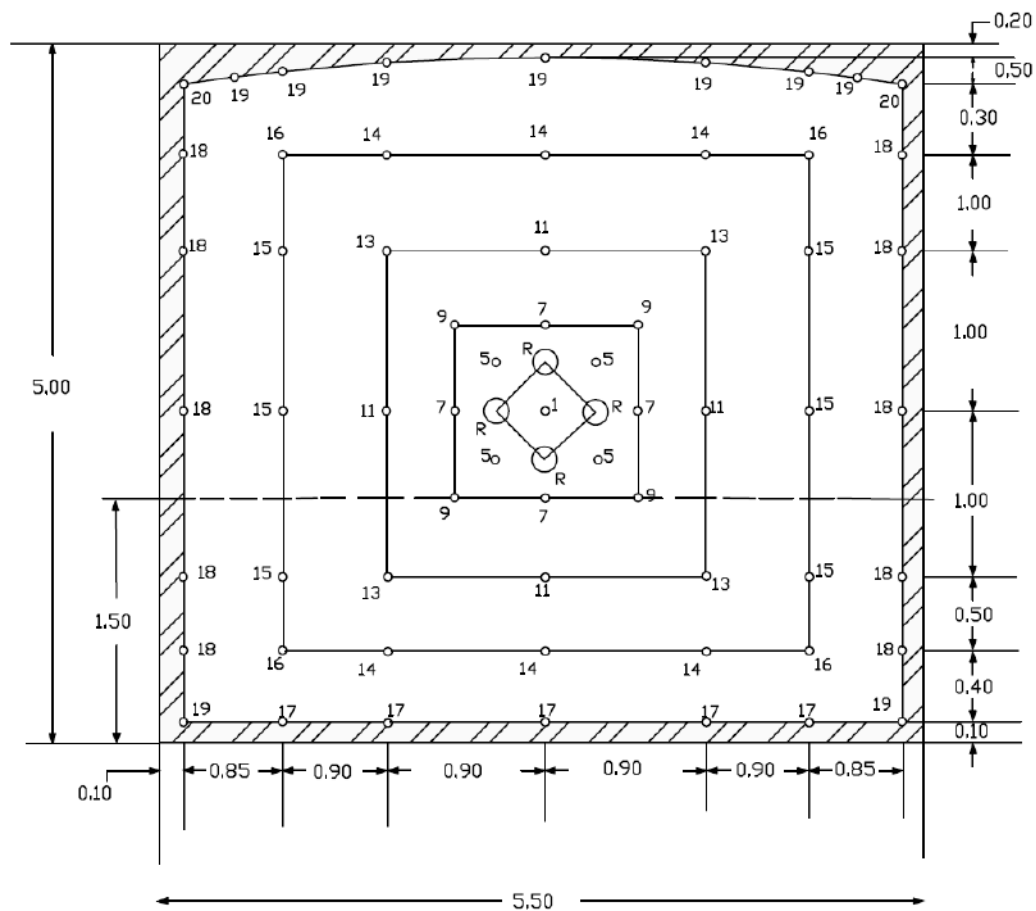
Recommended blast delay pattern for development faces of Baroi underground mine, HZL.
